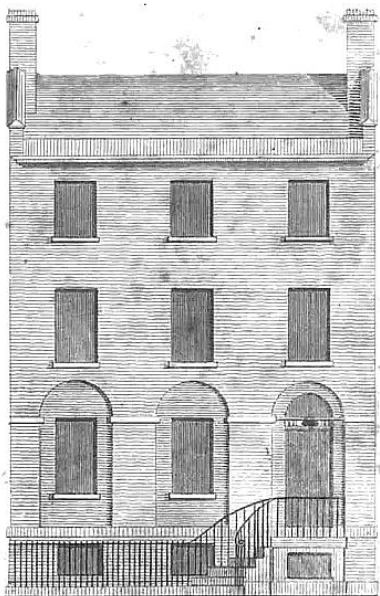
Plan for a Town House (1806). From Asher Benjamin, *American Builders Companion*, Plate 51 (image reversed to depict right-sided doorway like those in the Daniel Haines and Roger B. Taney houses). Benjamin's image of recessed first-floor windows and entrance door illustrate a variation of a popular façade whose interior plan could be modified to suit its owner. At the cornice are Benjamin's signature dentil bricks.
